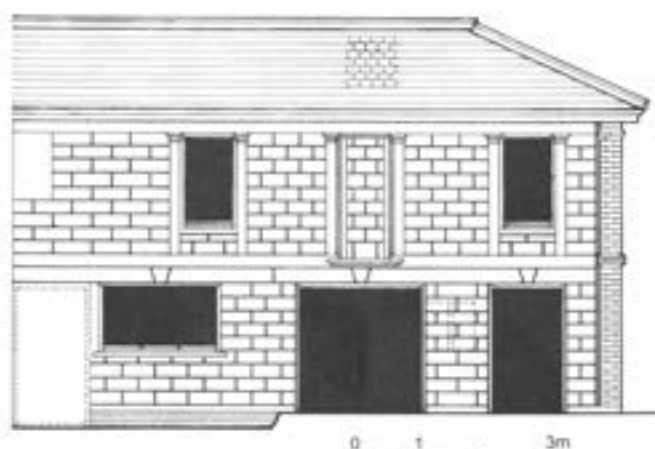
Market Row: elevation of the west wall of the outbuilding with rusticated weatherboarding and a fish-scale slate roof (survey by D. Stenning and P. Skeet, ECC).
